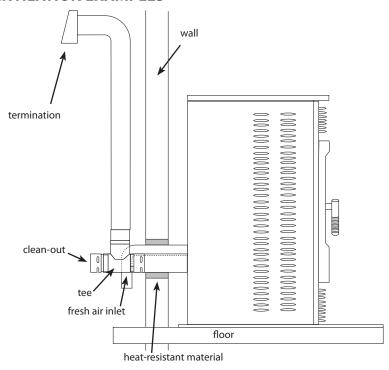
Straight Installation—Outside Vertical Rise, Horizontal Termination
